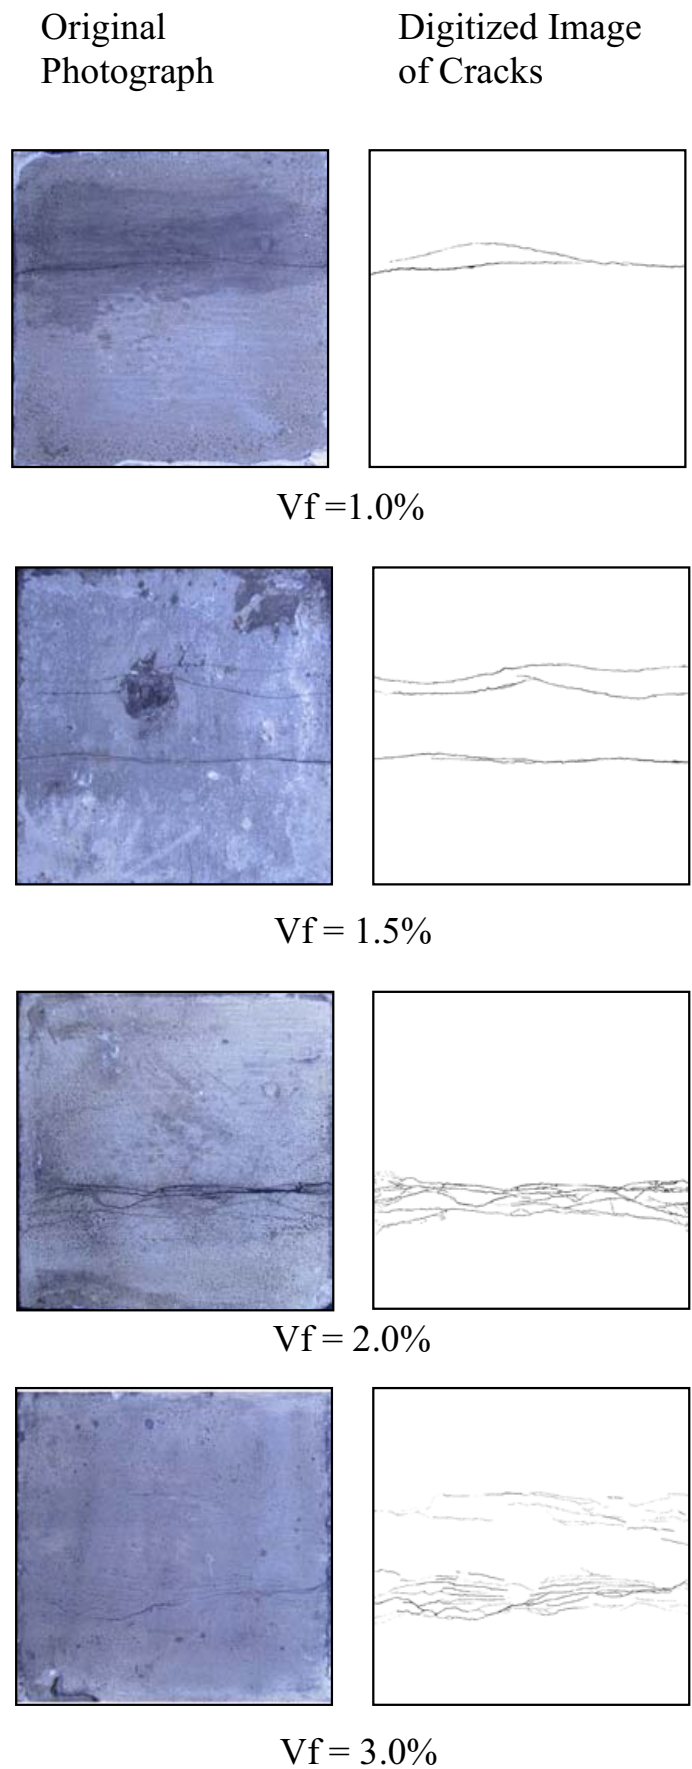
Typical Multiple Cracking Behaviour of HPFRCC Specimens
